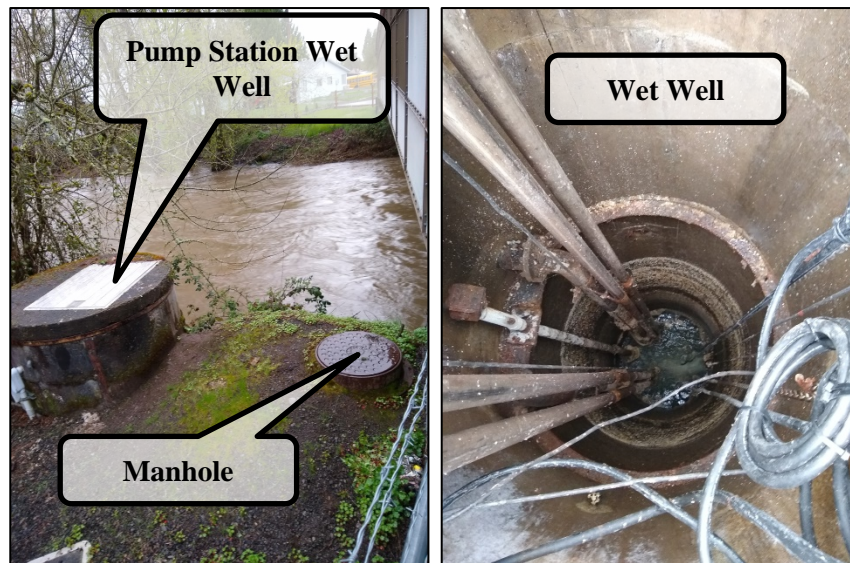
shows the Beech St. Pump Station near Thomas Creek. The first photo shows the manhole that receives influent from the two 6-inch ductile iron pipes that lie within protective casing and run north to south on the bottom of Thomas Creek, functioning as an inverted siphon or depressed sewer. In general, wastewater flows should be at least 3 ft/s and should not exceed 12 ft/s to avoid potential wear and tear due to erosion and abrasion. Based on a maximum flow of 12 ft/s and a 6-inch diameter pipe, capacity through one siphon line is 2.3 ft³/s, or 1,032 gpm. The inverted siphon has a total capacity of 2,064 gpm since it is comprised of two 6-inch lines. During I/I testing, the inverted siphon appeared to be operating within this capacity. Wastewater is conveyed by the siphon westward to the nearby wet well housing the two pumps and float controls. In the past, the City has utilized pump trucks to isolate the inverted siphon and wet well to perform debris removal. Periodic debris removal will help to increase the useful lifespan of the inverted siphon, wet well, and pumps; The City will look to incorporate a debris removal plan as part of the pump maintenance schedules once they are developed.
